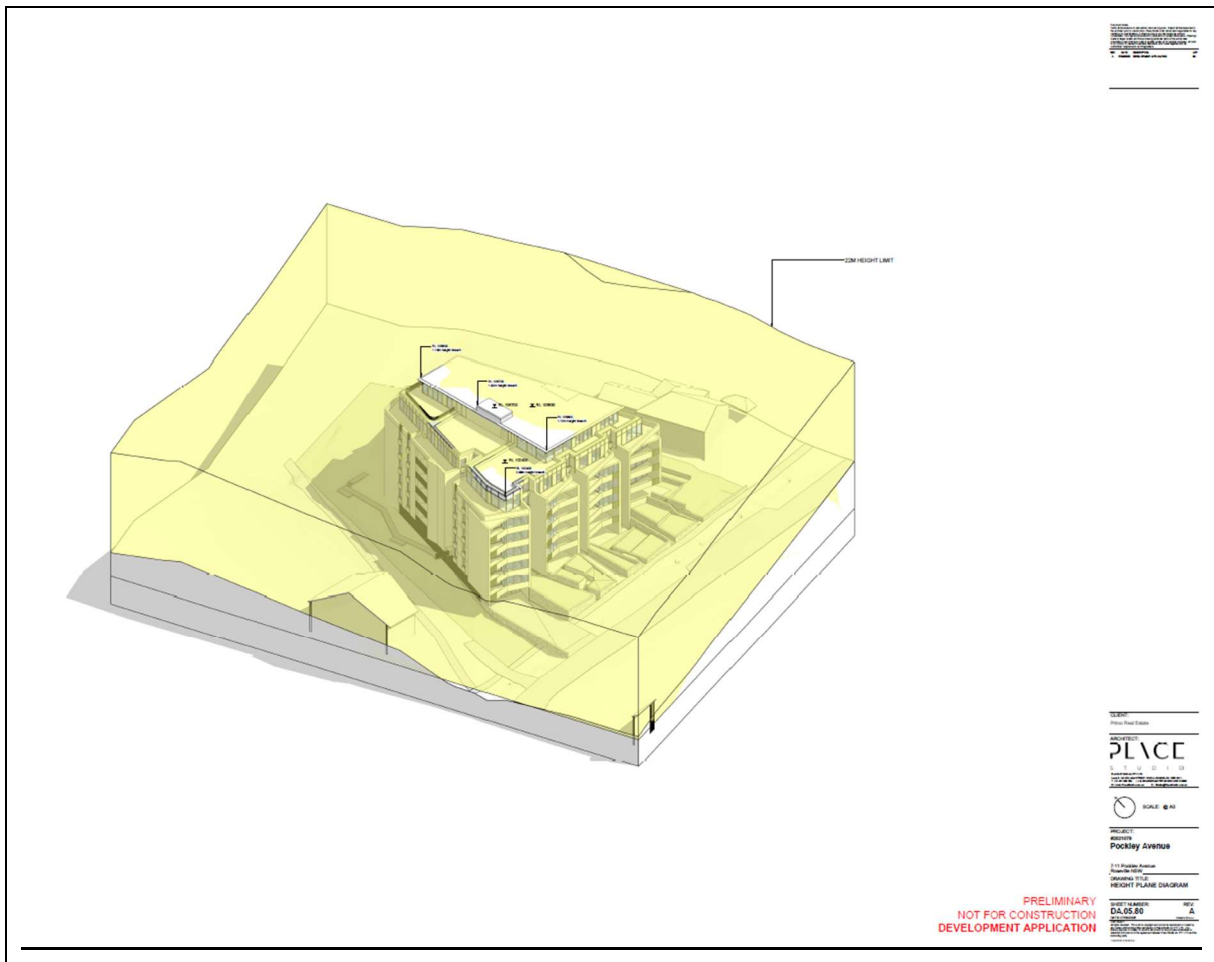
Building height plane as shown within architectural plan sheet number DADA.05.80 Revision B
